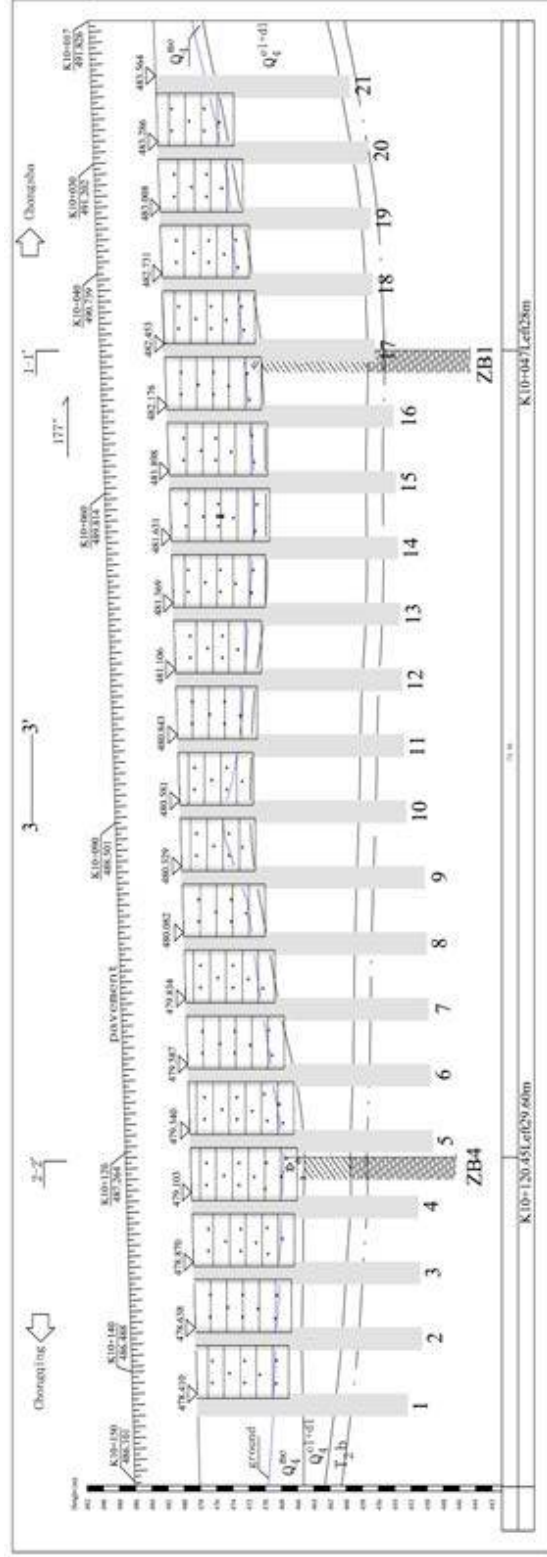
The elevation arrangement plan of sheet-pile wall in high-filled embankment of K10+022 ~ K10+144t
